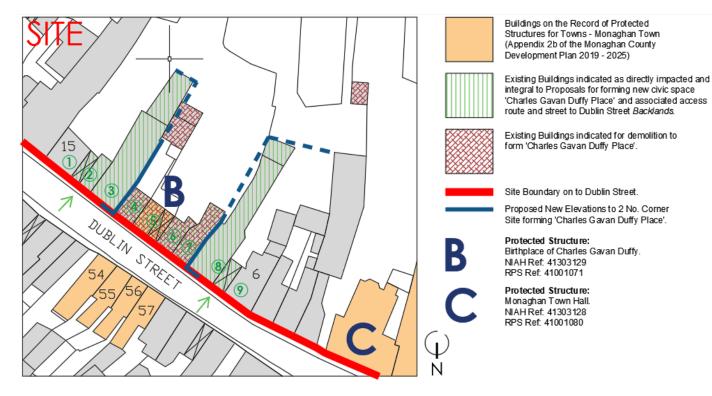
Existing Plan – Site Review (Consarc)
